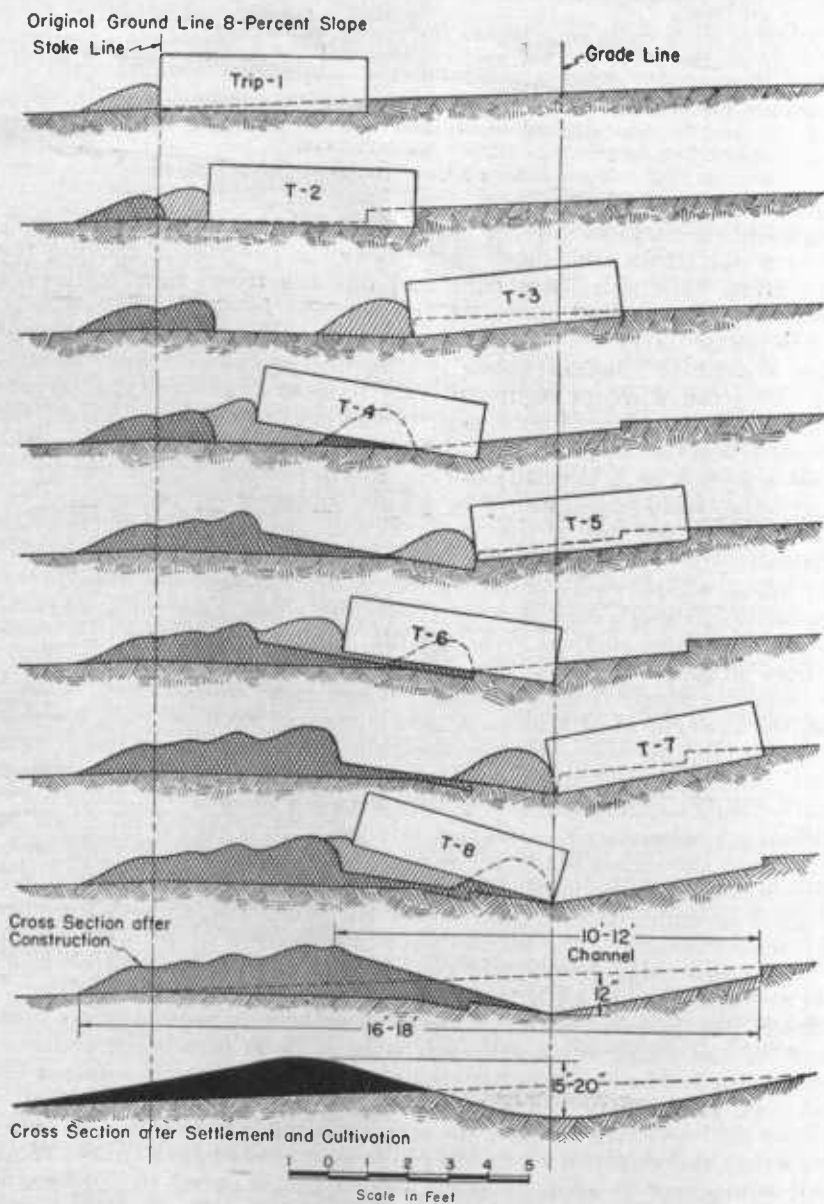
Progressive steps in constructing a drainage-type terrace in the Southeast with a 10-foot blade terracer. The terrace is constructed from the upper side only.
